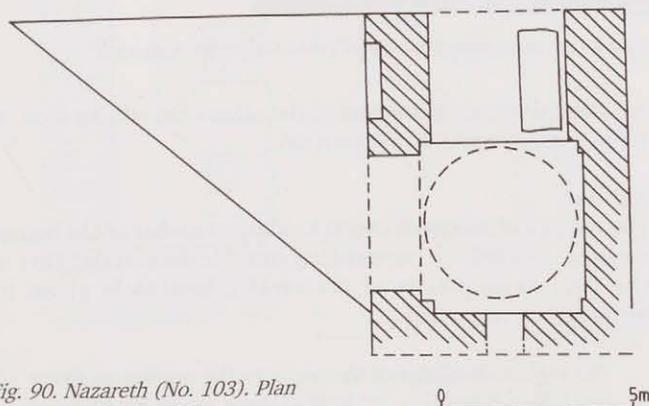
Nazareth (No. 103). Plan of Maqām Shihāb al-Dīn.
